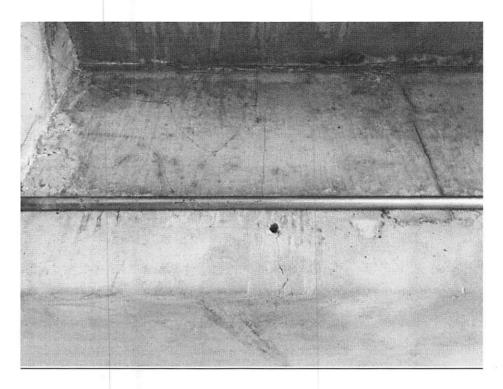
Vertical and diagonal cracks on a soffit beam.
